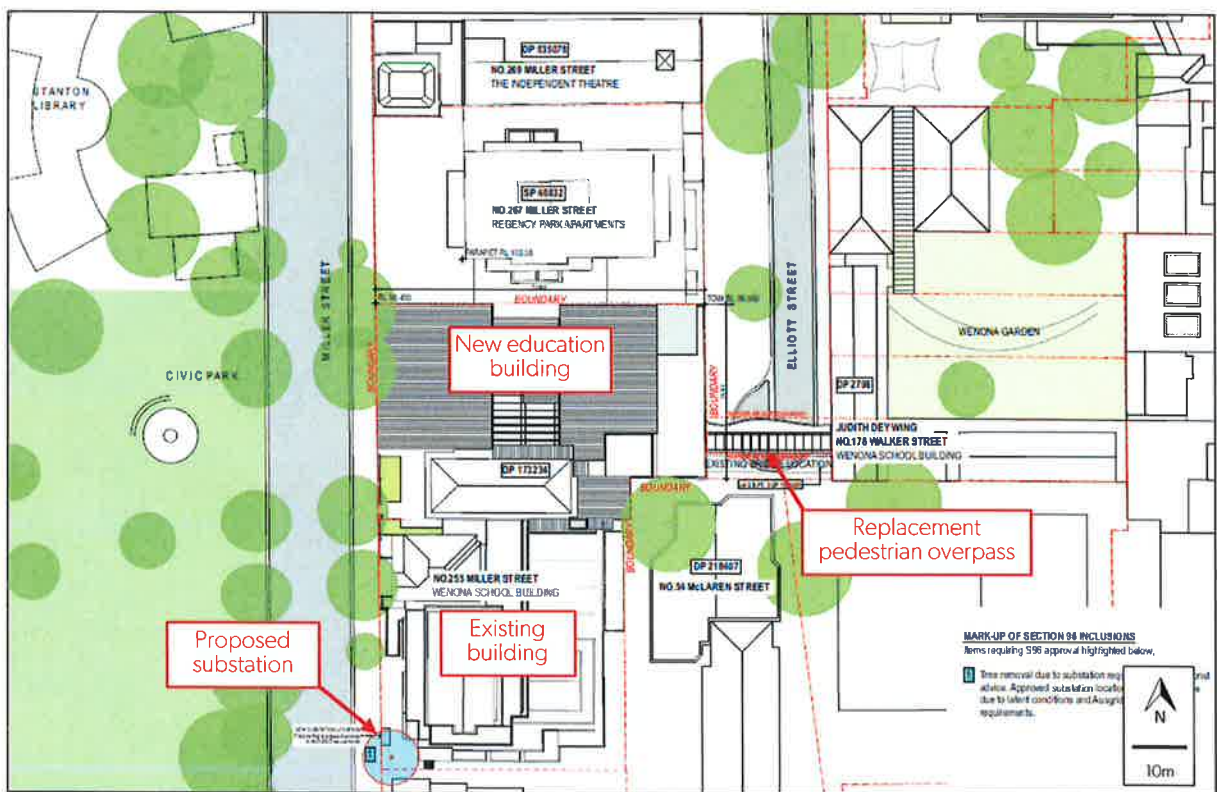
| Site location (Source: SSD 6952 MOD 1 2017)
